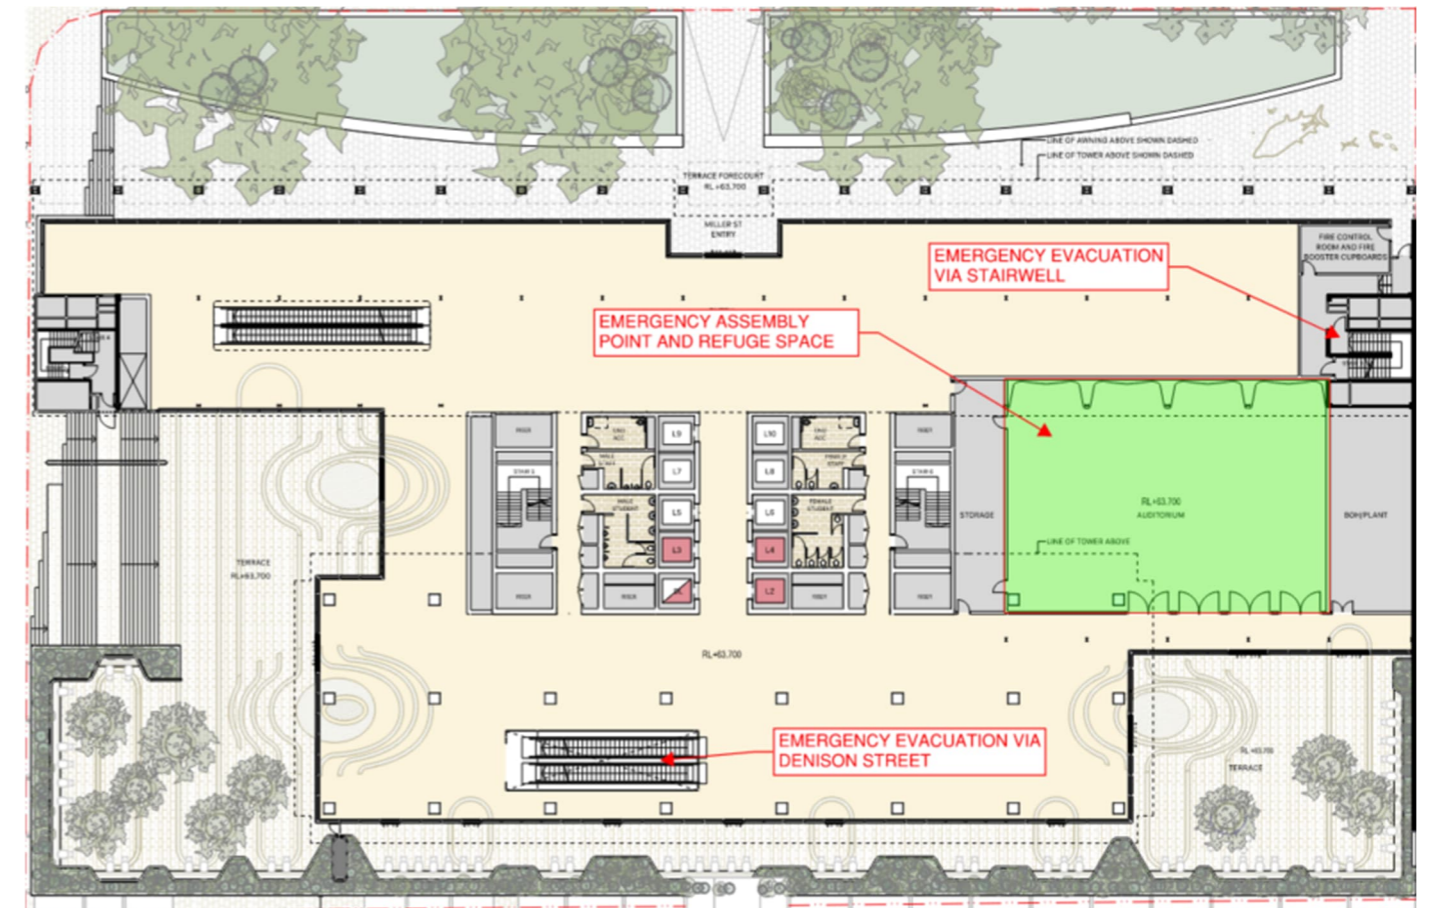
Proposed Refuge Space in Auditorium on Upper Ground floor
